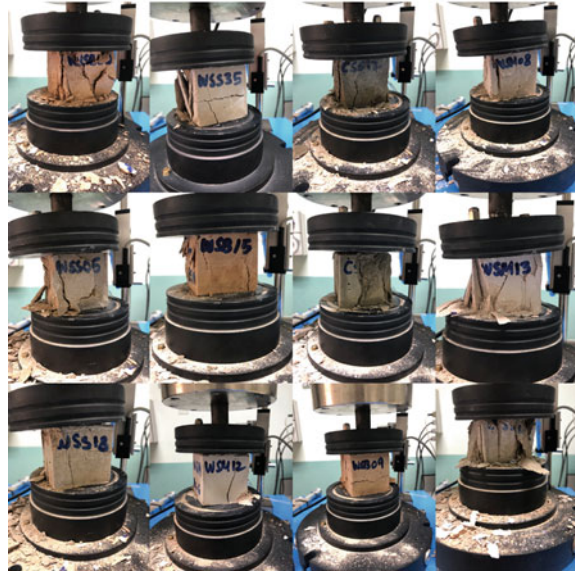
Failure modes of trial mix specimens tested in a compression machine
